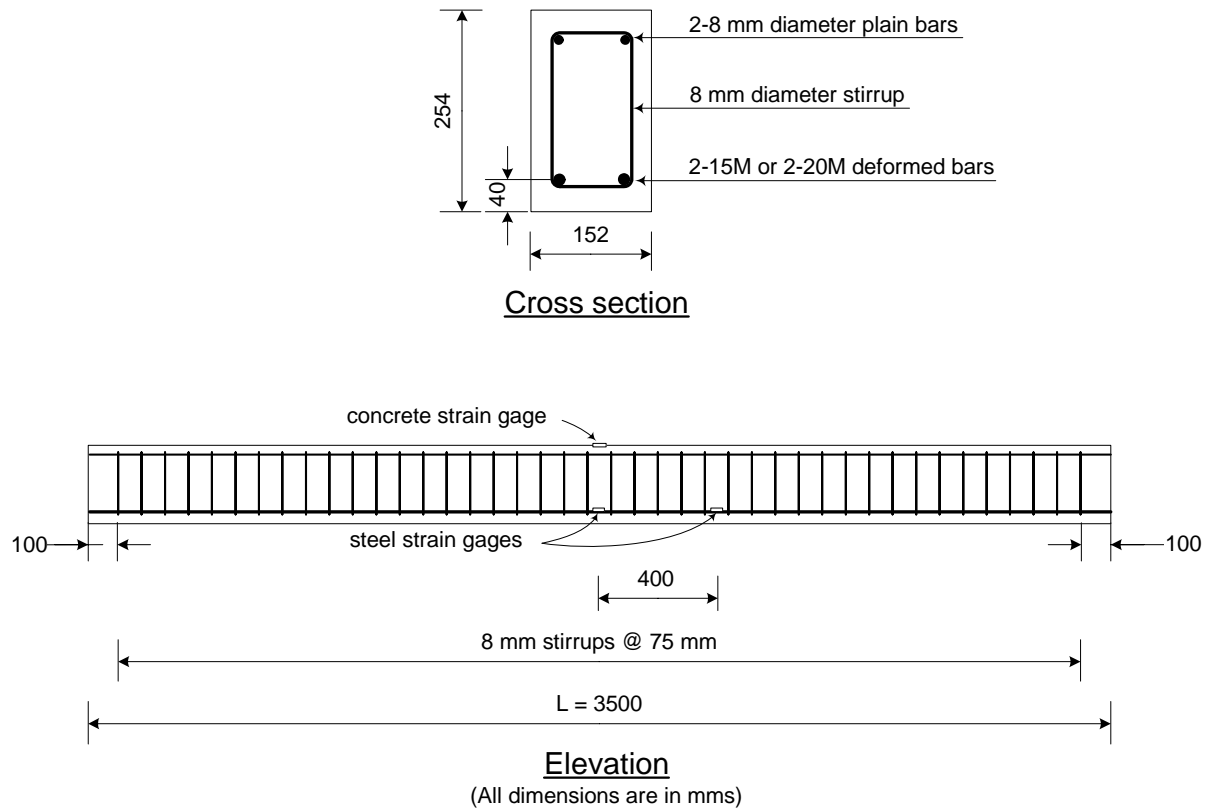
Typical dimensions and reinforcement details of the virgin beam specimen
